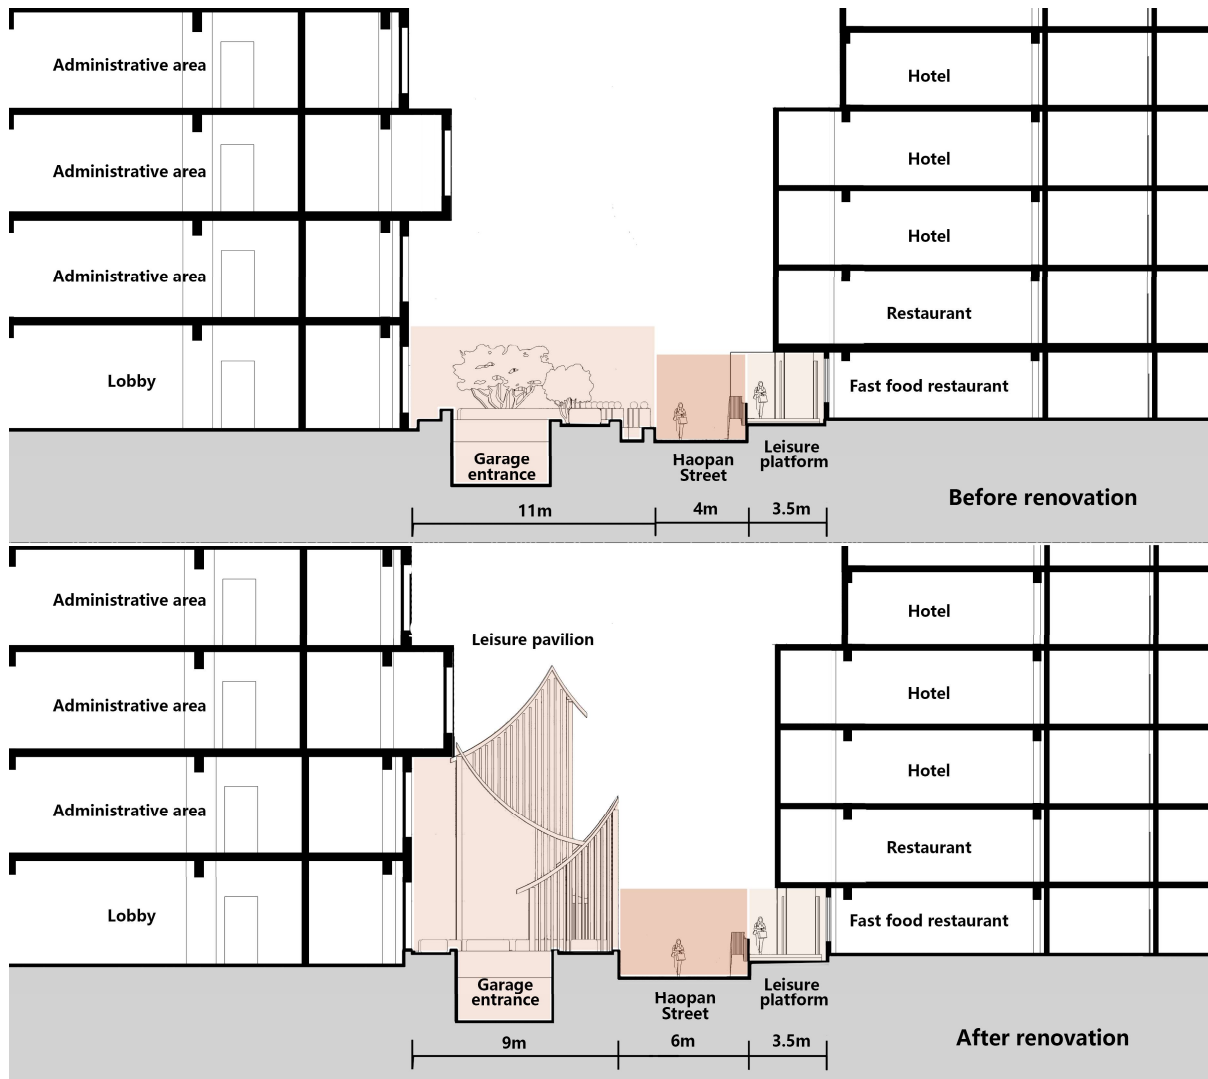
East Entrance Pre - and Post Renovation Sectional View
